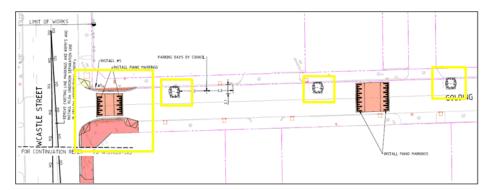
Safe Active Streets Design Extract (Golding Street and Newcastle Street intersection)
